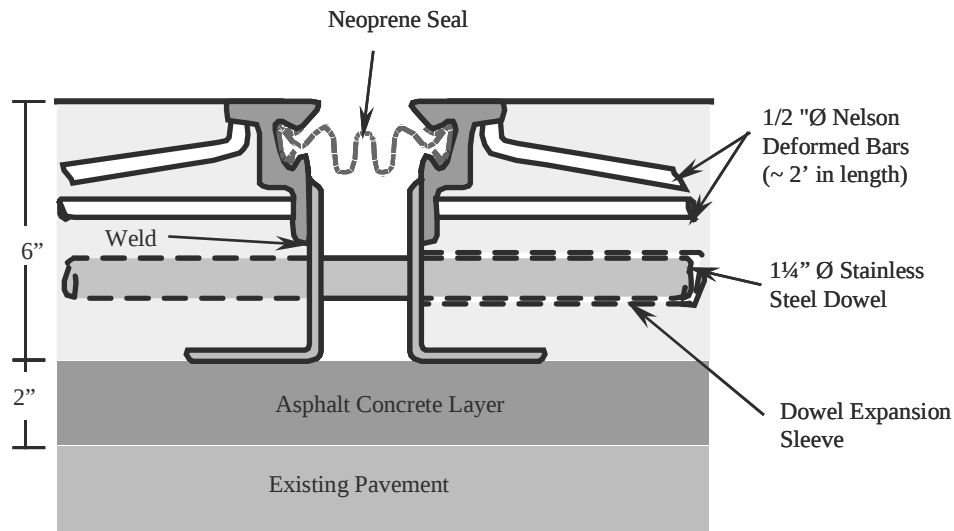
Expansion joint detail for the McLennan County prestressed pavement⁽²⁾
